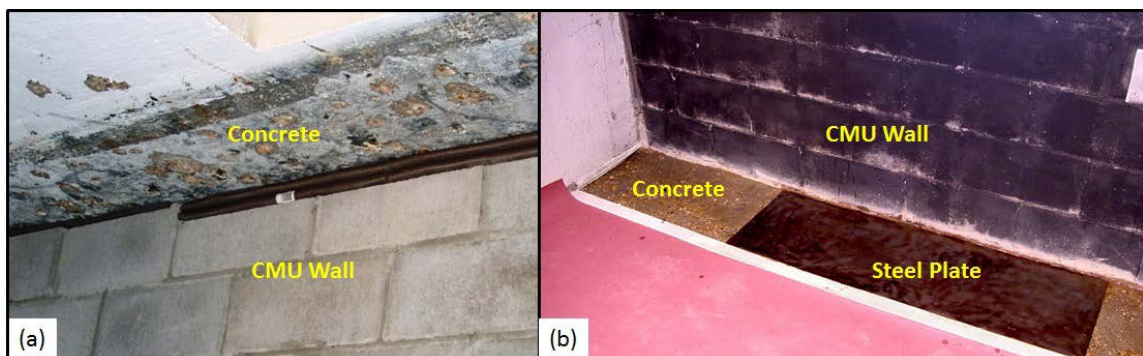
Substrate at supports. (a) All concrete substrate at top support. (b) Bays 3 and 4 have a mixed substrate of steel and concrete on the bottom support.
